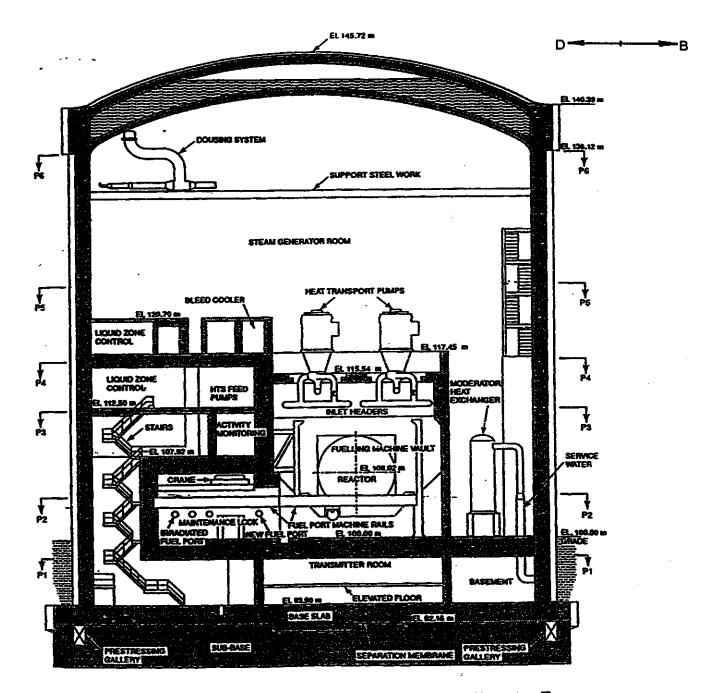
Reactor Building Elevation Section at Reactor Face (Section S3 on Figure 2-14)
